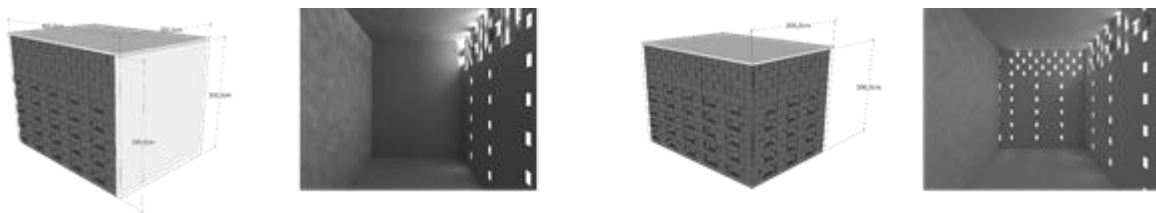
Room model, using modified design 1 with one-sided and two-sided opening walls
